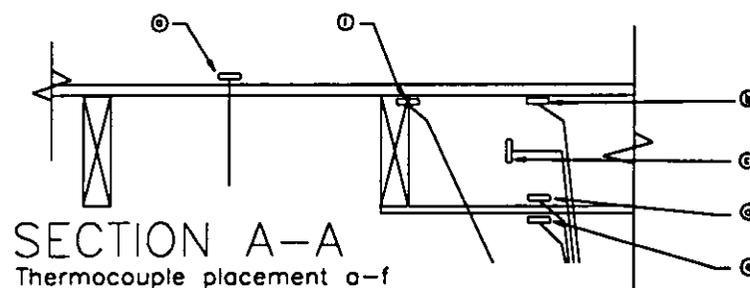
Floor section identifying location of thermocouples, full-scale test 1.
